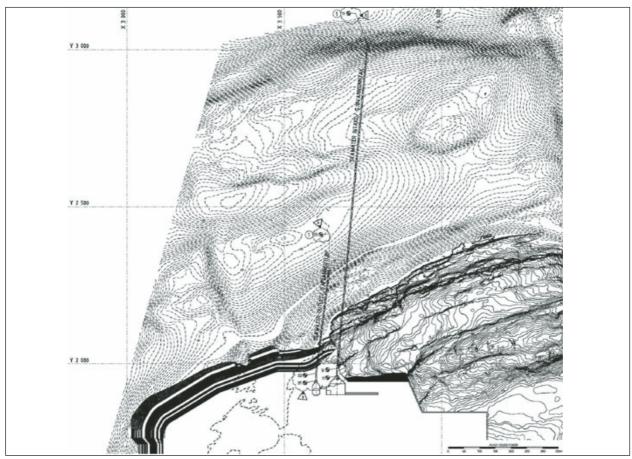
Plan view of the Intake and Outlet Tunnel. (Illustration: Multiconsult /Statoil)
